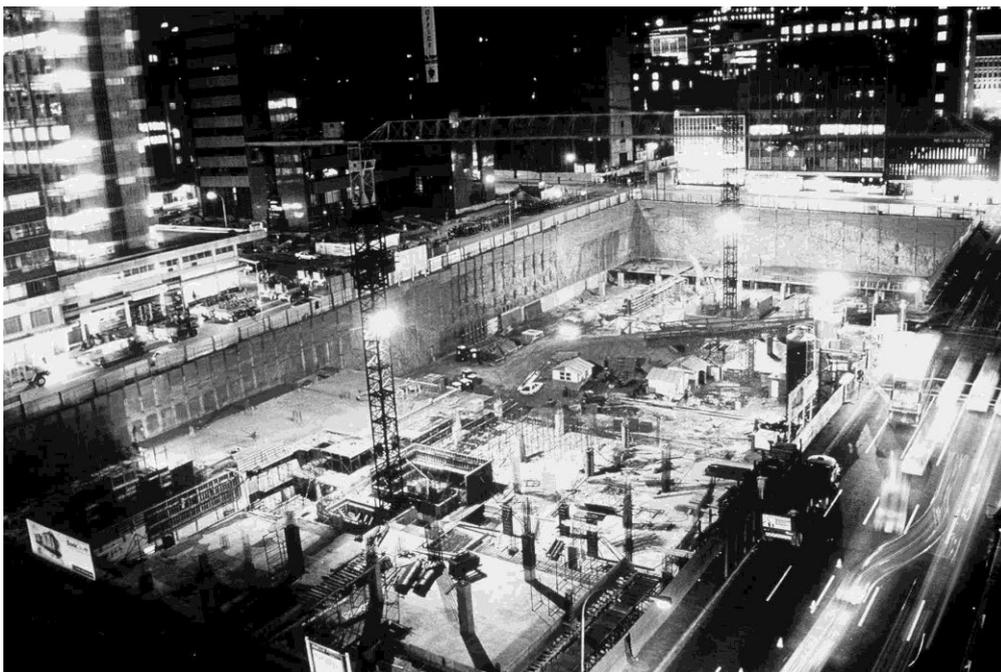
Basement excavation constructed under the new code: Johannesburg, 1989.
